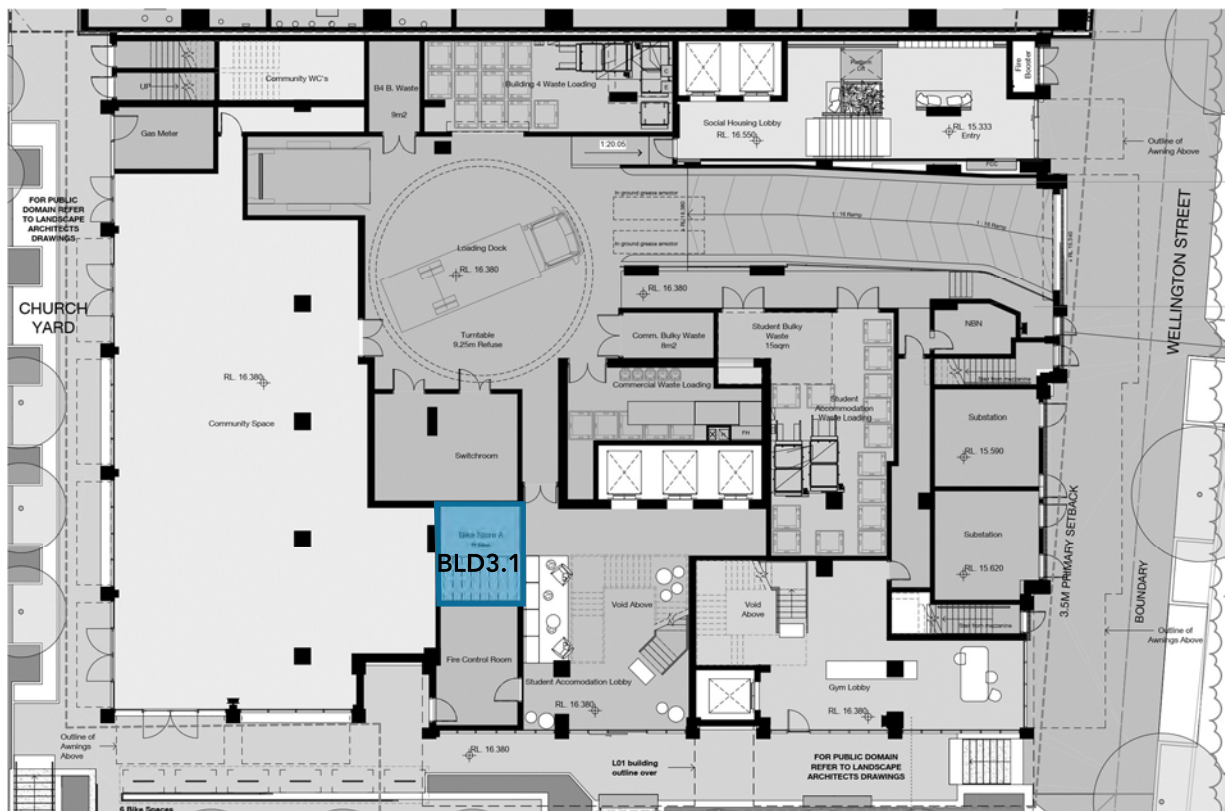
Building 3 General Arrangement Plan – Ground Floor, Rev L (Source: Bates Smart)
